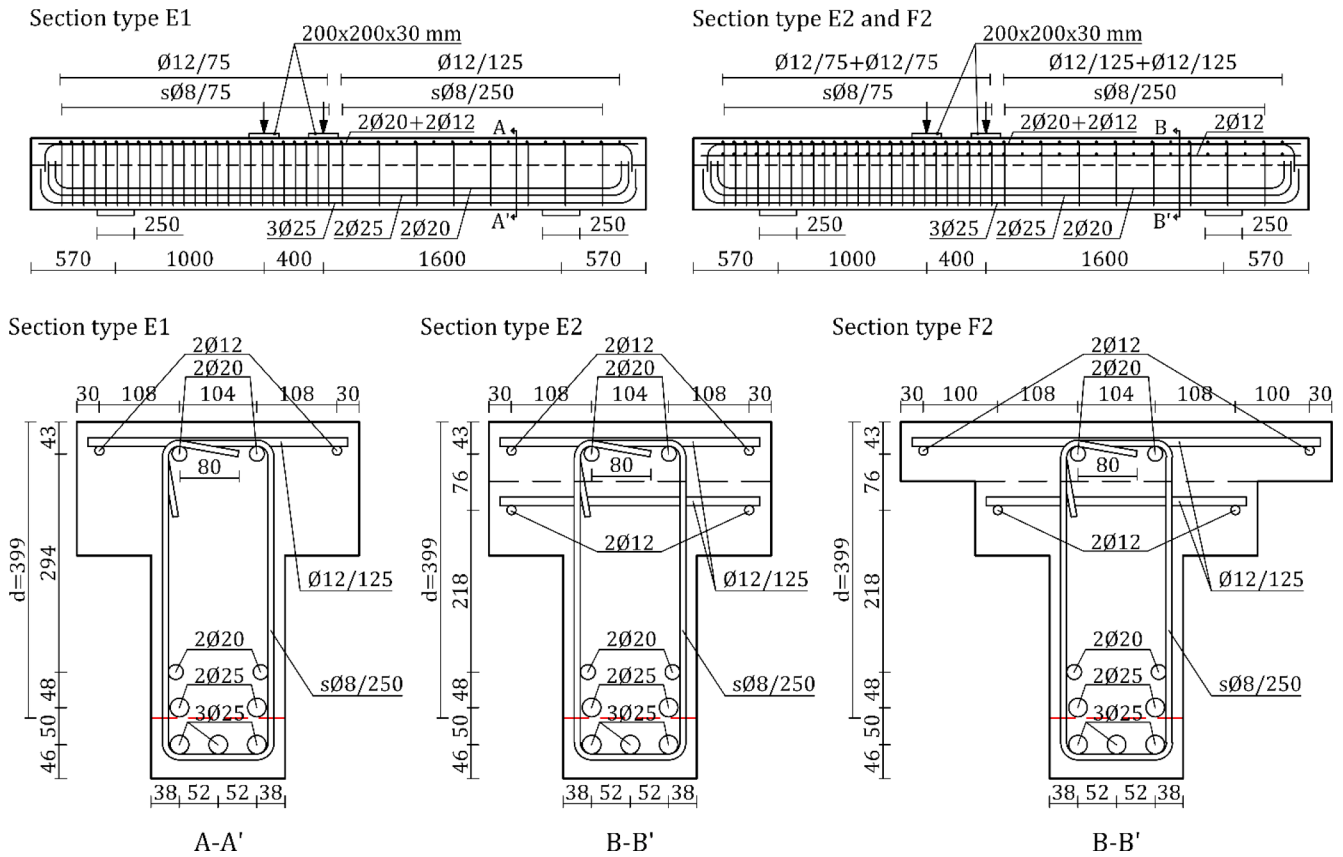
Dimensions and reinforcement of the specimens with cross-section type E and F (dimensions: mm).
